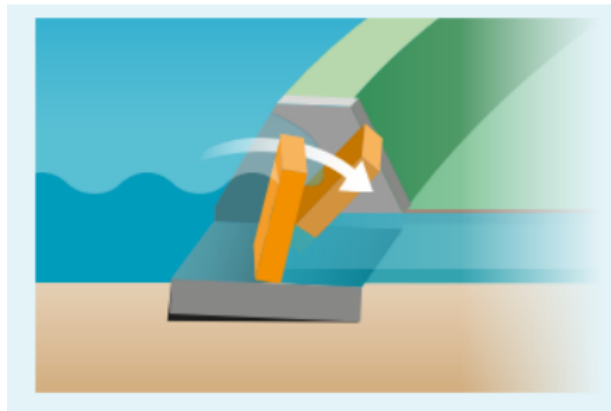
Failure mechanism of structural failure (Onwuachu, 2021)
